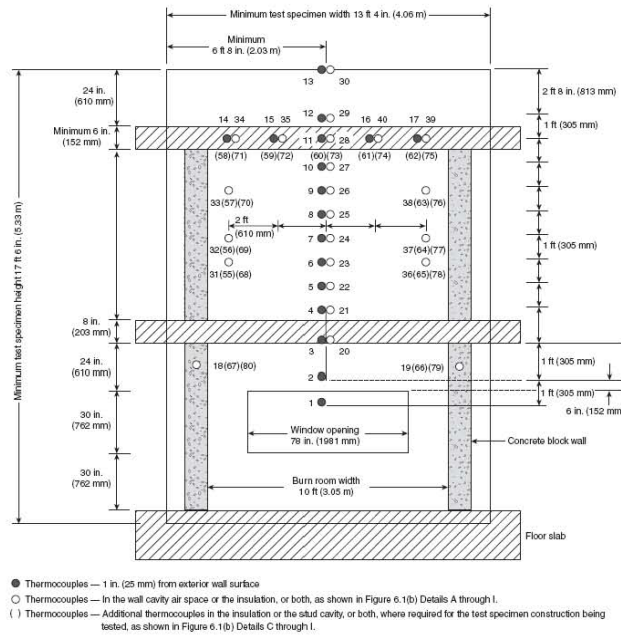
(a) Front View of Test Specimen Superimposed over Test Apparatus Thermocouple Locations.
